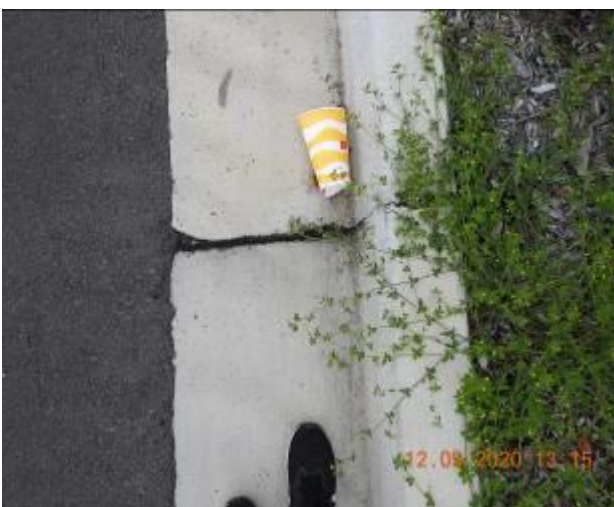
Crack propagation and loss of material through kerb and gutter
